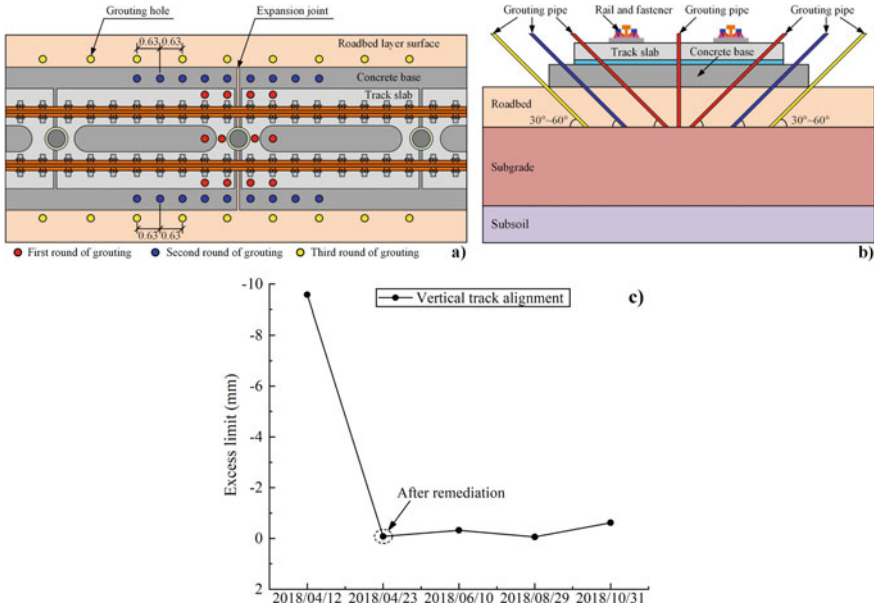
Modified polyurethane grouting remediation method in ballastless slab track: a layouts of the grouting holes (unit: m); b relative positions of grouting pipes; c vertical track alignment before and after remediation
